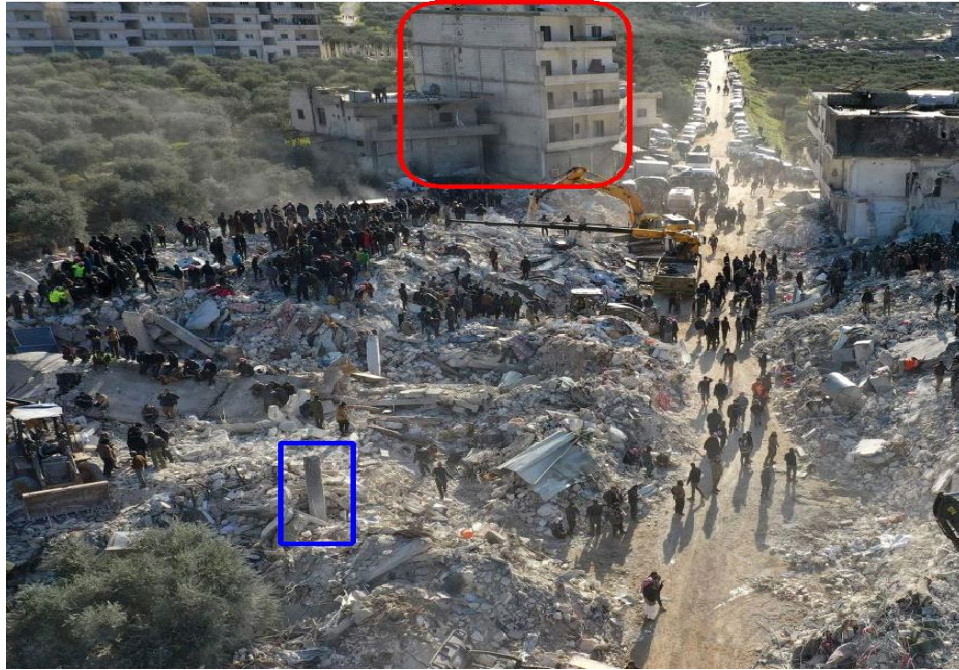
Collapsed masonry & RC buildings, Besnaya, Reef Idlib (Source: [AFP via npr.org](#)).
